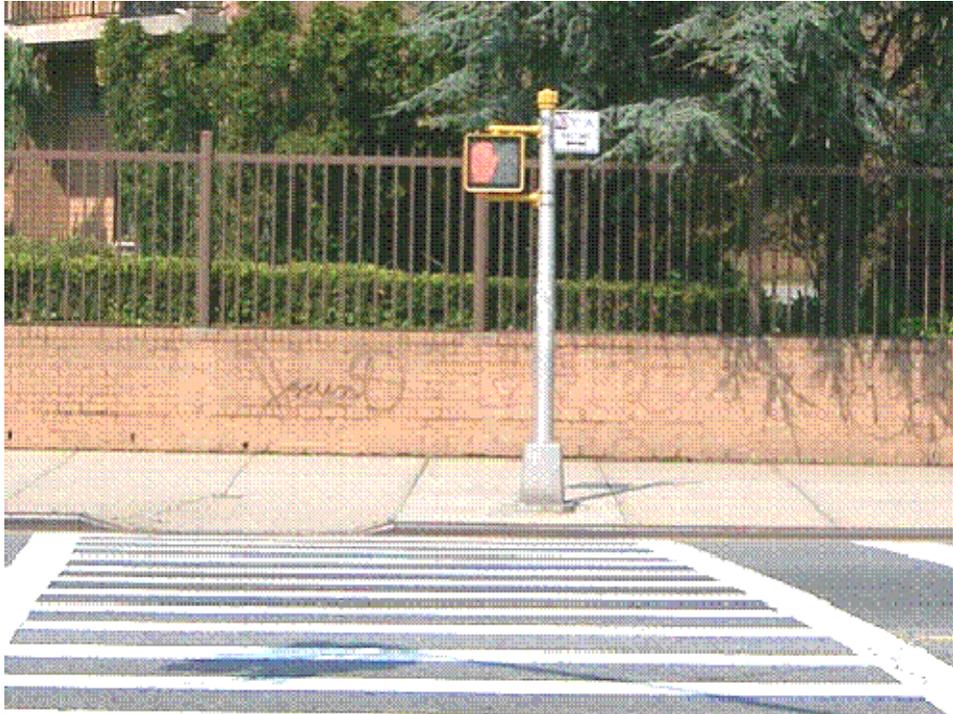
Looking to the west side of Parsons Boulevard at the intersection with 75th Road (note the pedestrian signal pole located in the path of the north crosswalk)
